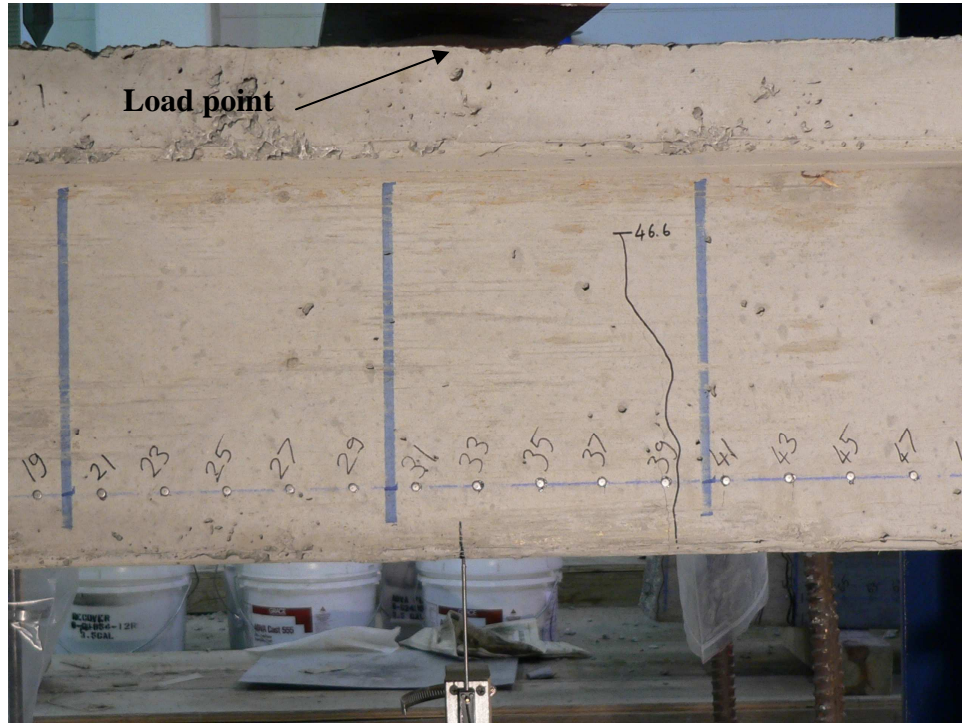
Flexural cracks under load point at 48 kips applied load - SCC-HS-W
